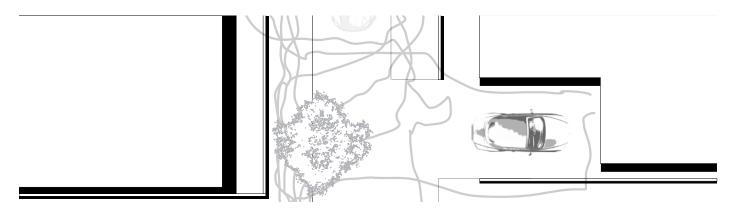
Laneway Plan 1:200 showing pedestrian walking routes and potential neighbourly interactions.
